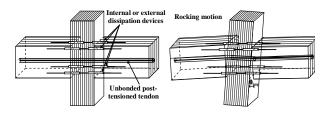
Basic concept of hybrid jointed ductile connections for LVL frame systems [13]
